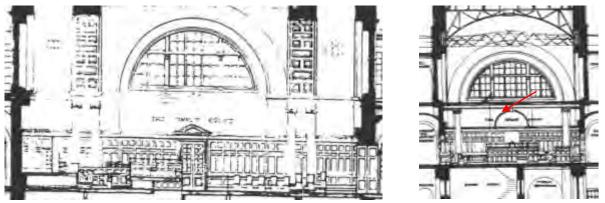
(left) A cross section plan showing the internal layout of the court, the decorative patterns of the wall panels and the elaborated door surrounds from 1899. Fig. 53 (right) Another cross section showing the design of the judges' bench including the arched moulding at the back (pointed)
